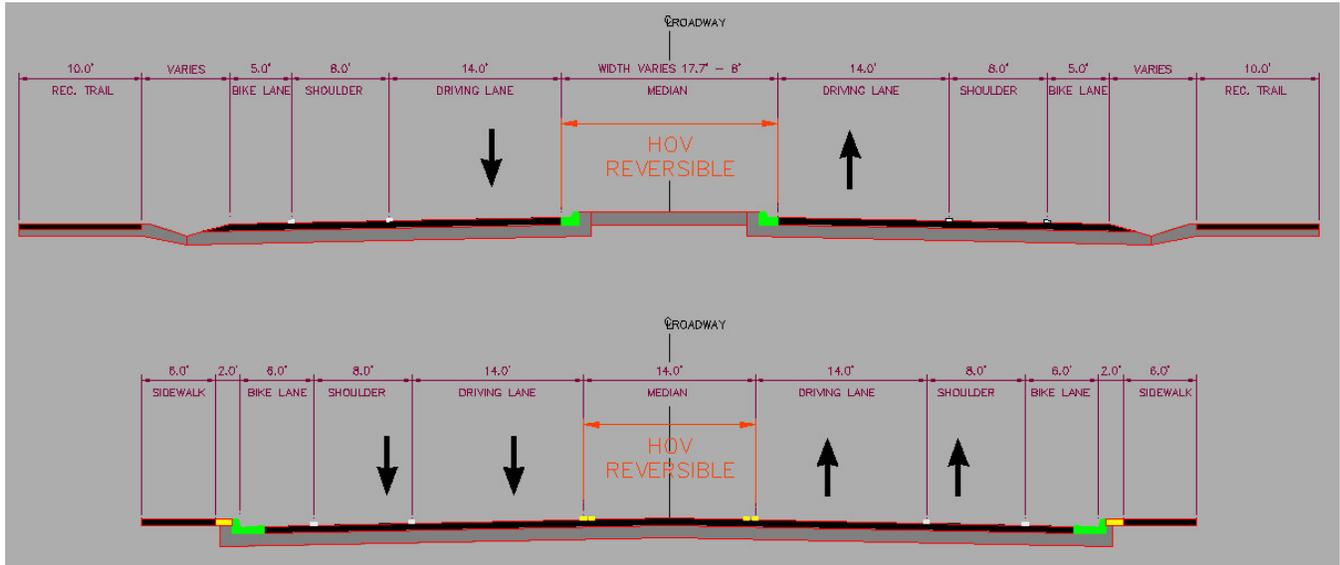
C – Montañó Road Typical Roadway Section with 2 Inside HOV Lanes with 2 Outside General Purpose Lanes
